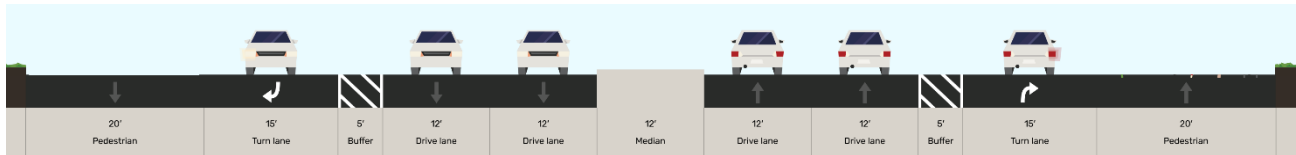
Existing SR 99 cross section under the SR 525 bridge. See cross section line in Figure 2 above. (Source: Streetmix)
